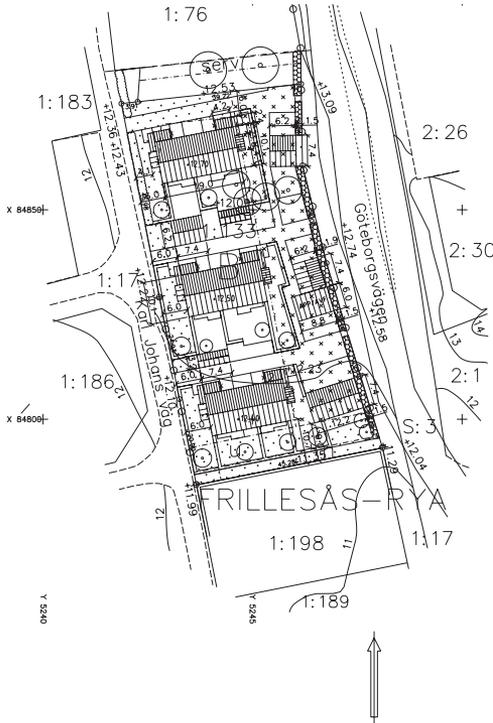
Site plan of the apartment buildings in Frillesås (Drawing: efem Arkitekter).
